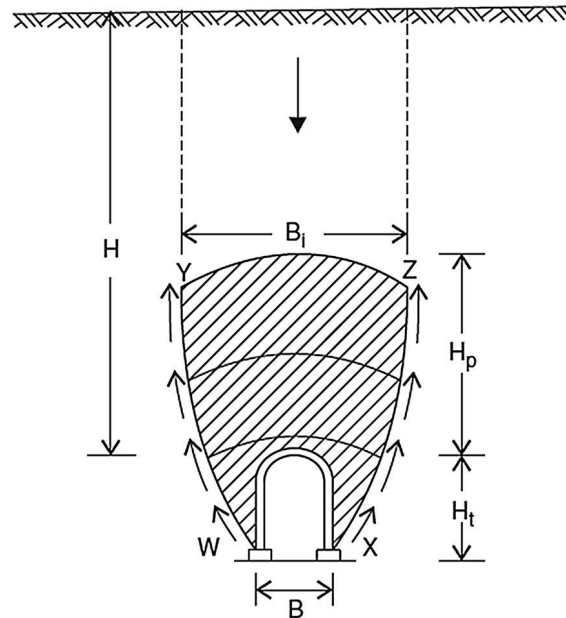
Development of loosened ground zone in response to tunnel construction. B and H_t are the width and height of the tunnel, respectively, H_p and B_i are the height and width of the arching zone, respectively and H is the depth of the tunnel from the ground surface.
